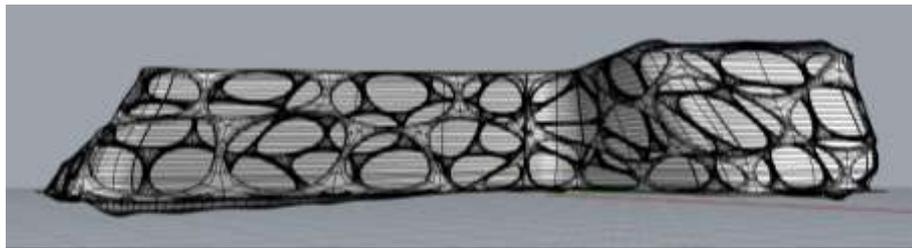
Layout 2- L Shaped Plan Building, Parametric Curvilinear Form
